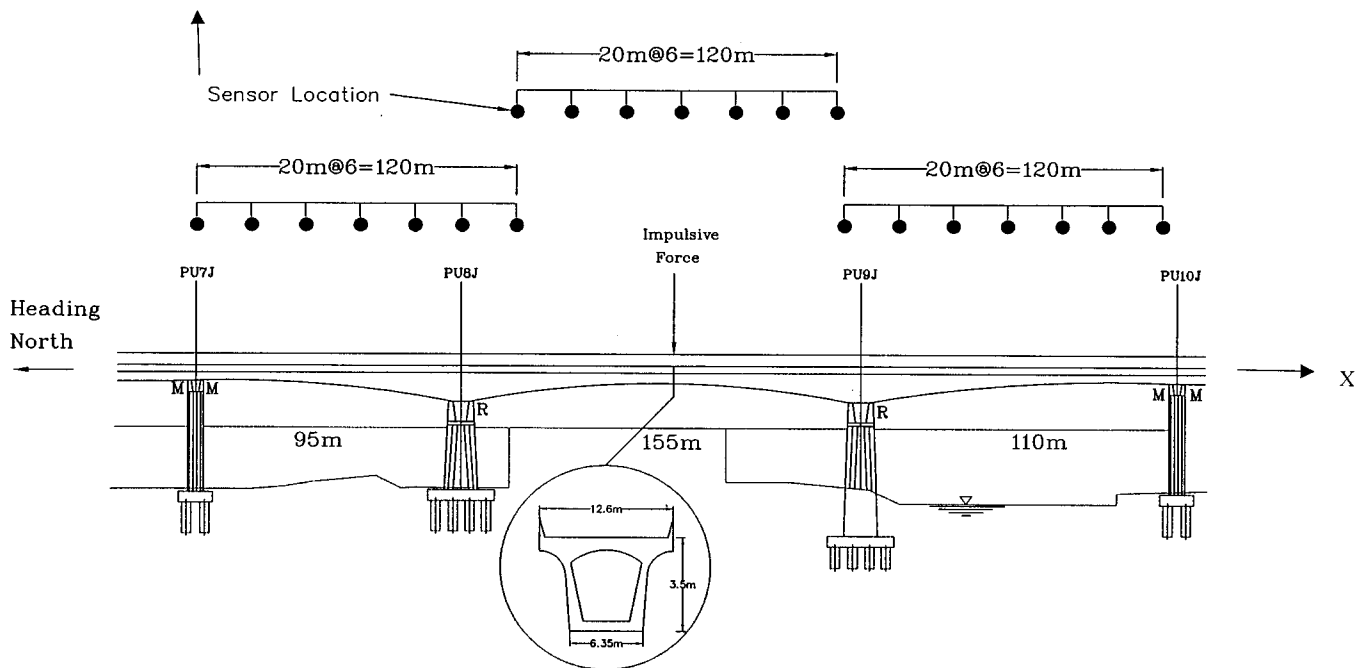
Northbound Yuan-Shan bridge system and sensor layout
